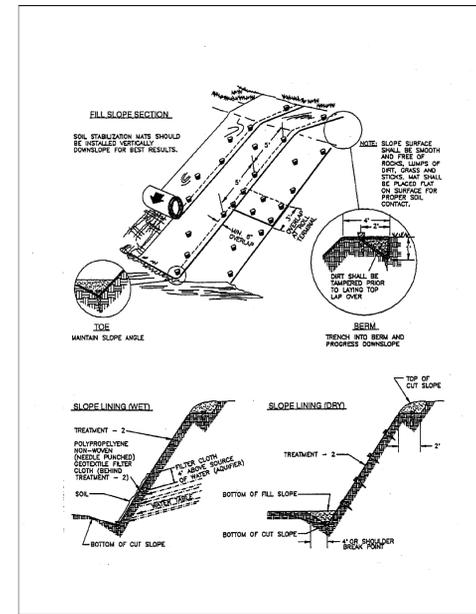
Typical Treatment 2 – Soil Stabilization Matting Slope Installation
